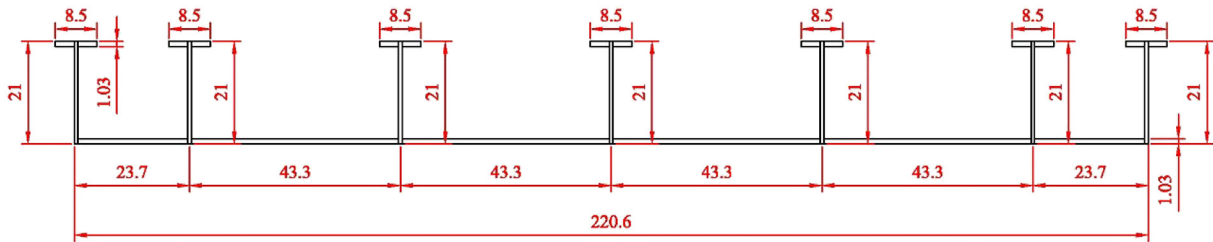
Transversal view of the small-scale model (dimensions in mm).
